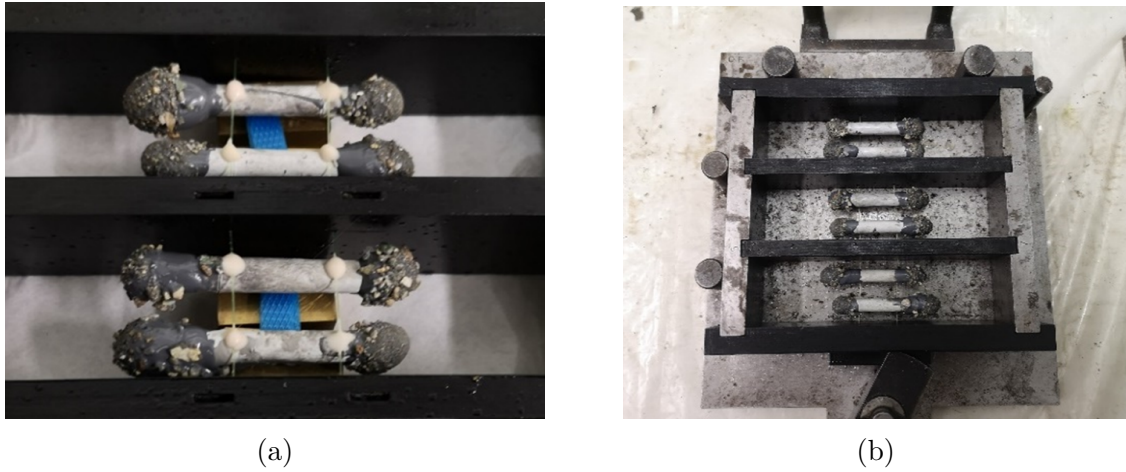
Mold used to produce the self-healing mortar prisms, before casting: (a) Bottom-up view of the capsules glued on the nylon threads with a methyl methacrylate (MMA) glue (X60, HBM, Darmstadt, Germany); (b) assembled and oiled mold with capsules in fixed position.
